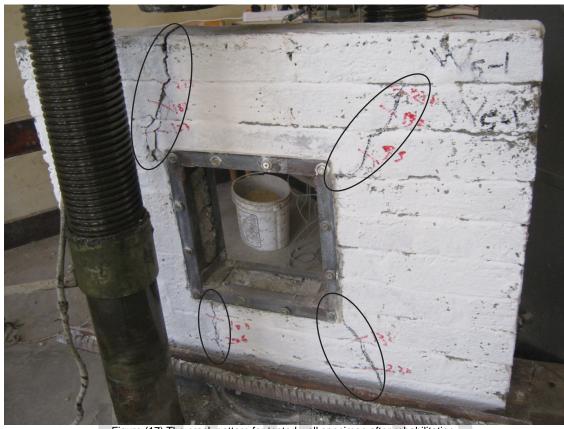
The crack pattern for tested wall specimen after rehabilitation
